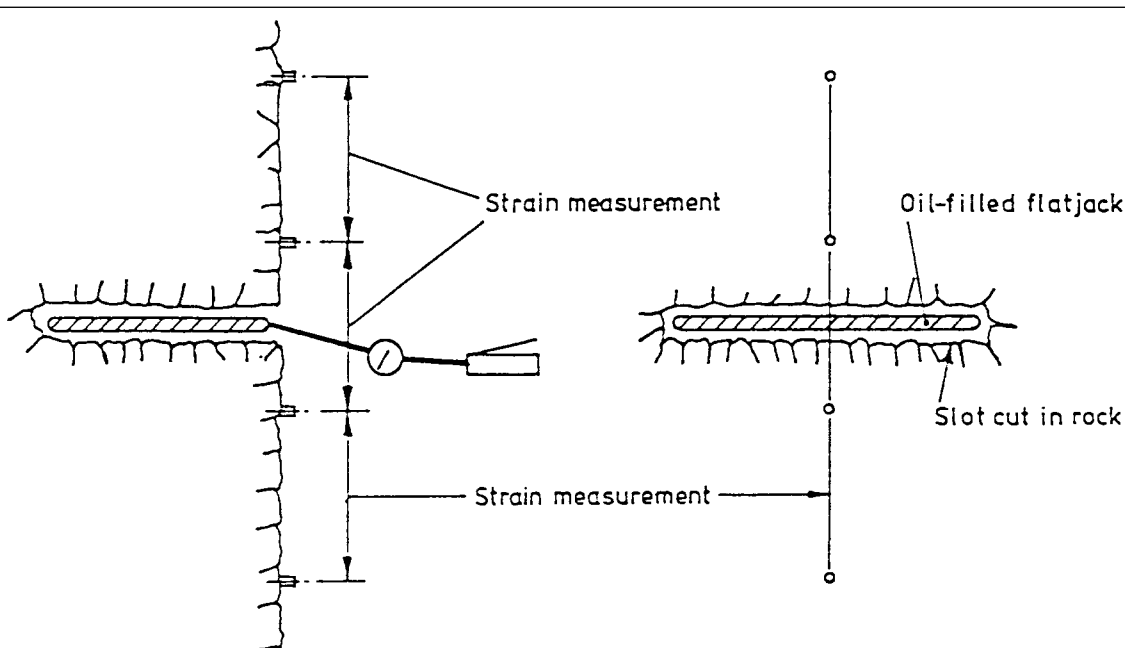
Measurement of in-situ stress — Flat jack equipment — Typical layout
